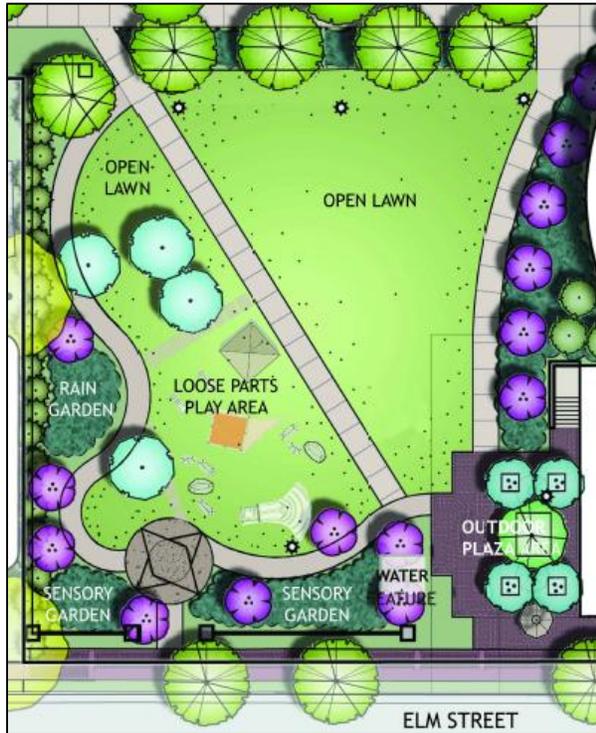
The applicant's design for the Elm Street open space (Source: Bowman Consulting and Niles Bolton Associates, June 1, 2014)
